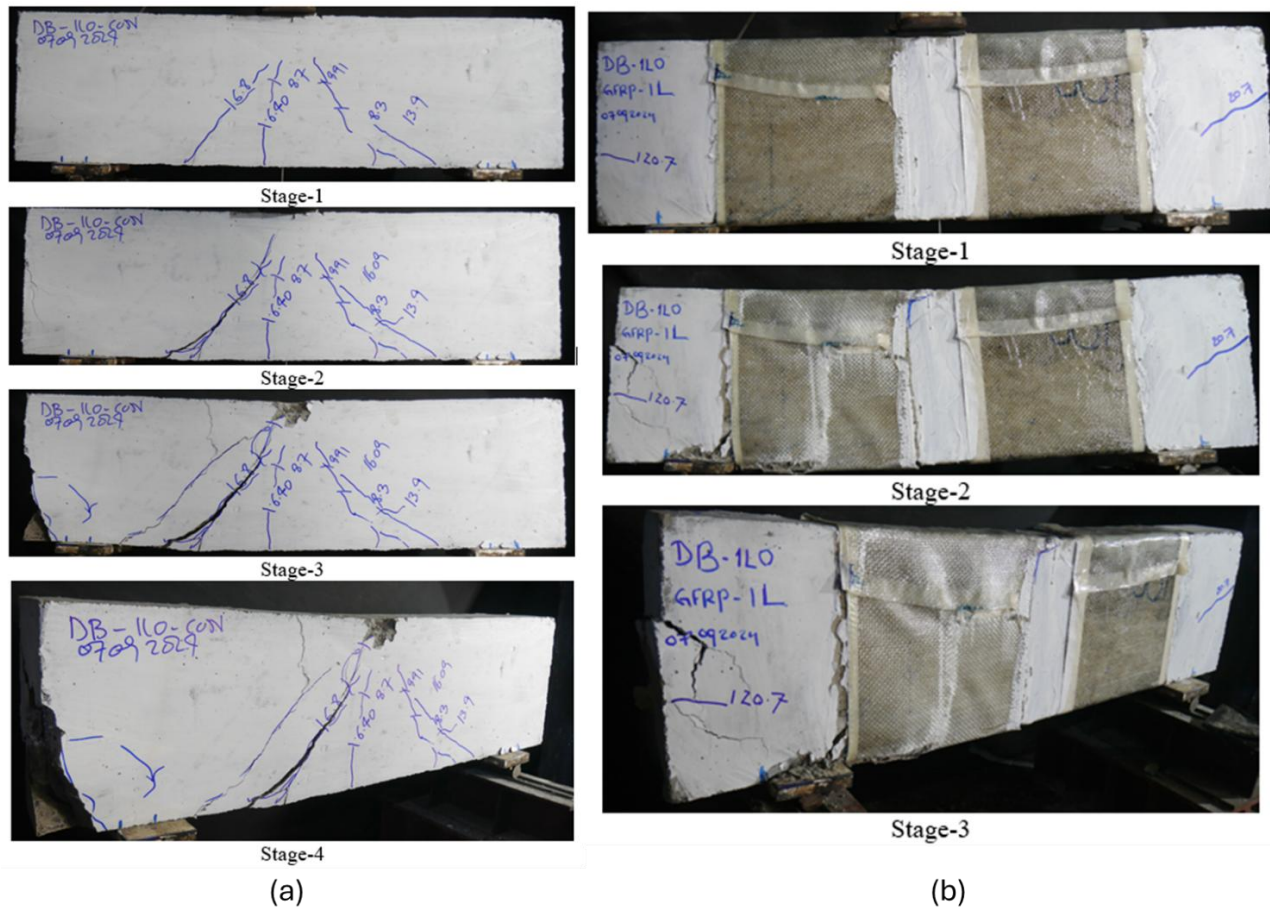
Failure mode of Group 2 beams: (a) DB-ILO-CON (sudden, shear-dominated failure), (b) DB-ILO-1G. (delayed failure, no debonding, vertical cracking in conjunction with inclined cracks).
